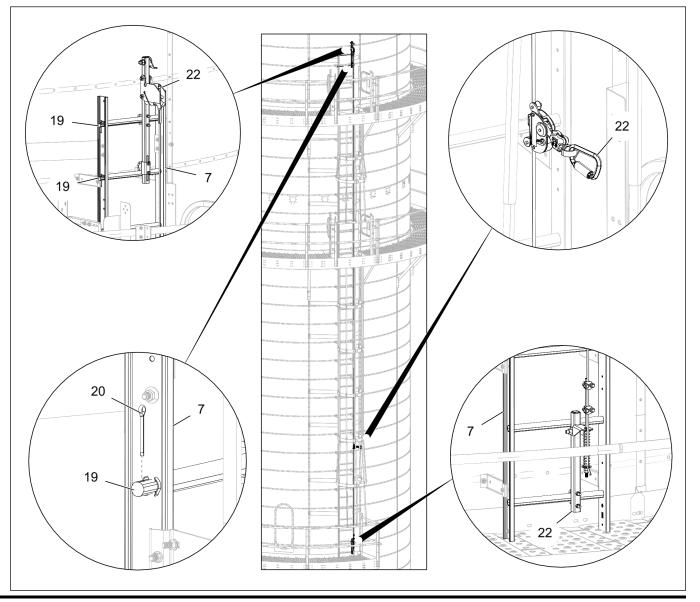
Installing the fall protection system between catwalk and fan style platforms
